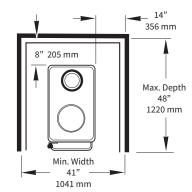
Alcove stove clearance with Double-wall pipe and wall protection.
